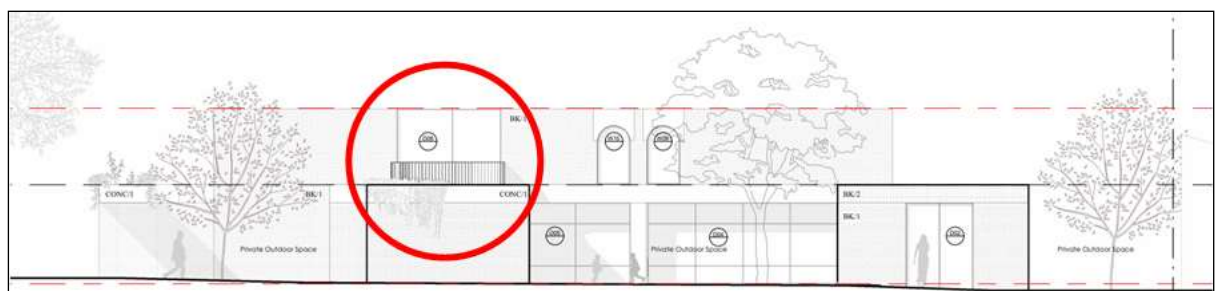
terrace on the east façade overlooking 6 Cadogan Crescent
